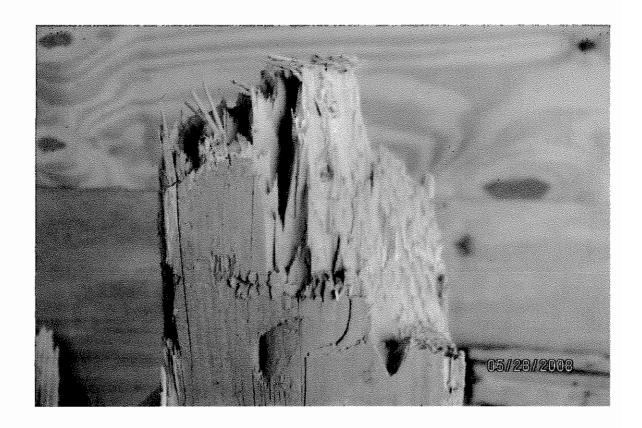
Brash failure with partial tension finger in 3x4 stored on 40th floor.
